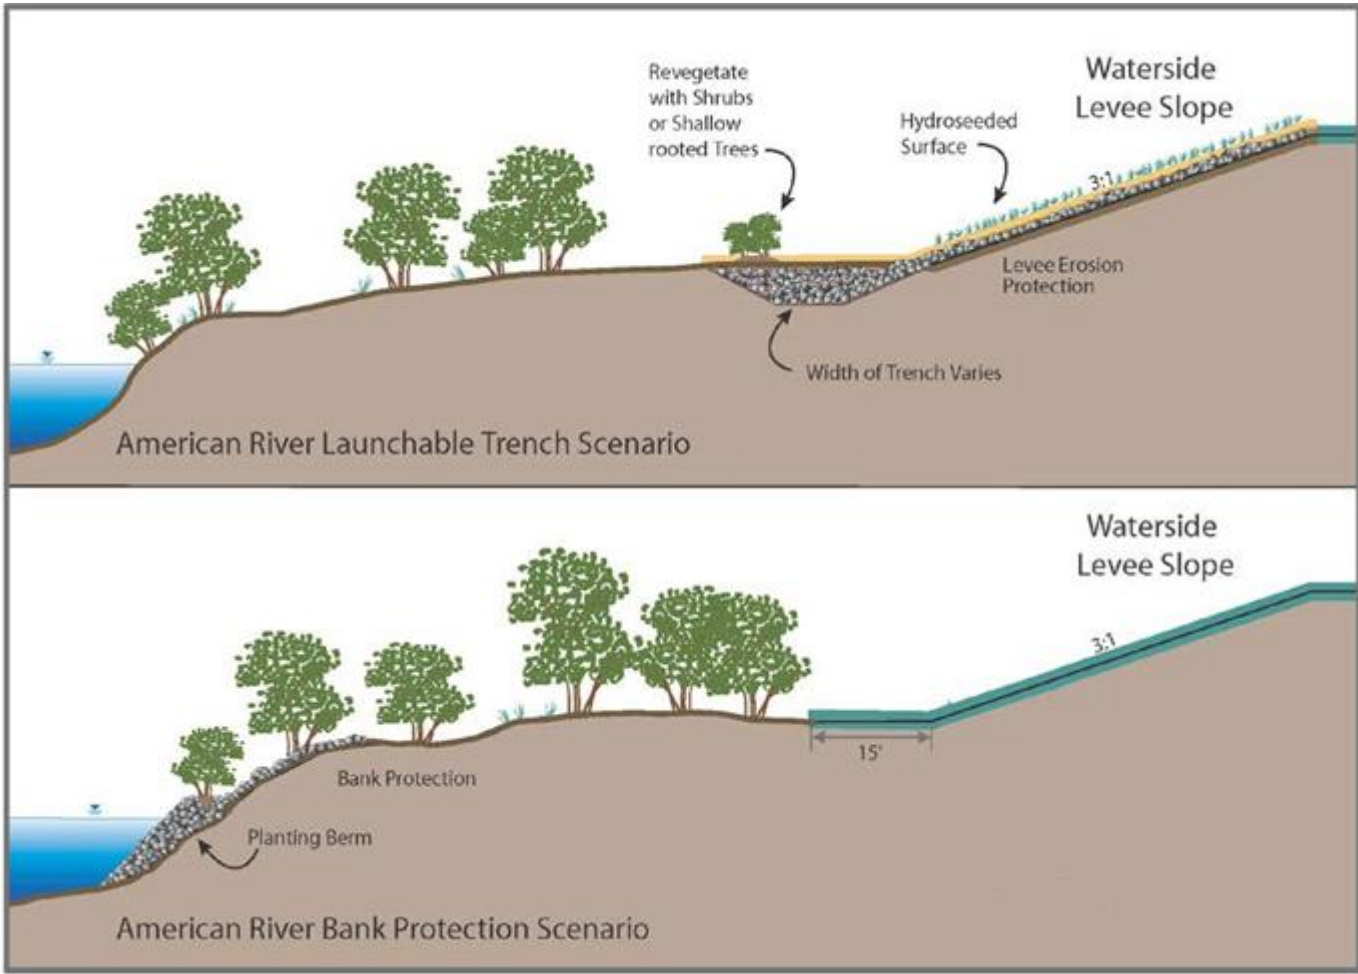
6 Bank Protection and Launchable Rock Trench Typical Design
